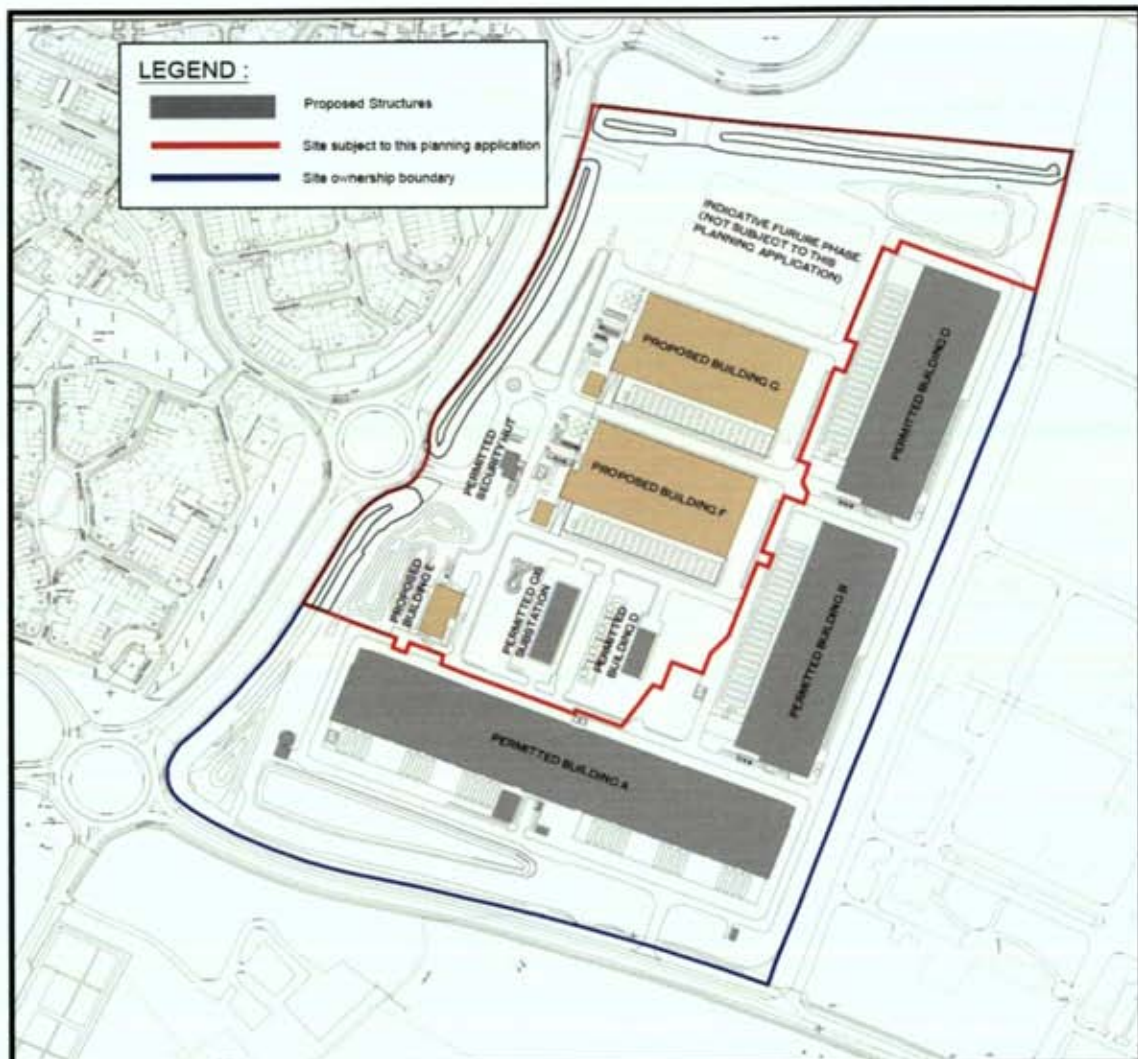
Site layout plan of the Proposed and Permitted Developments (Source: Henry J. Lyons Architects November 2022)
